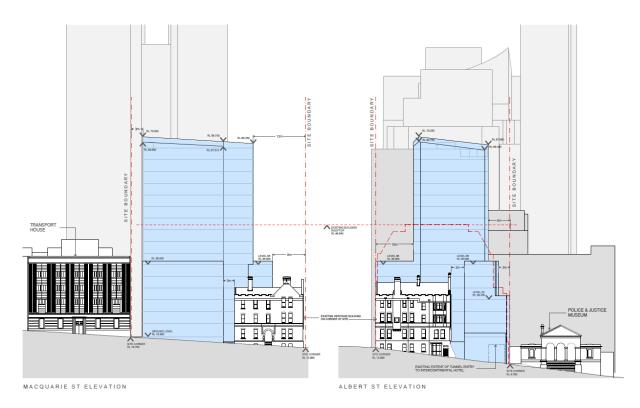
Proposed maximum envelope elevations to Macquarie Street (left) and Albert Street (right)
